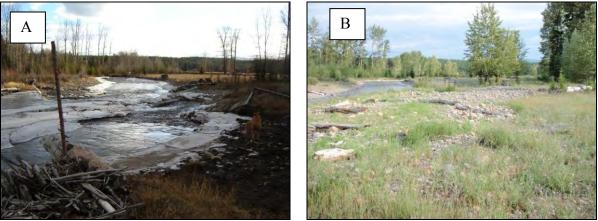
Photograph A shows the cattle water gap prior to construction. Photograph B shows the site the summer following construction of a soil lift and back-filling the access ramp. Material removed from Site 8 shown in Figure 13 was used at this site.
